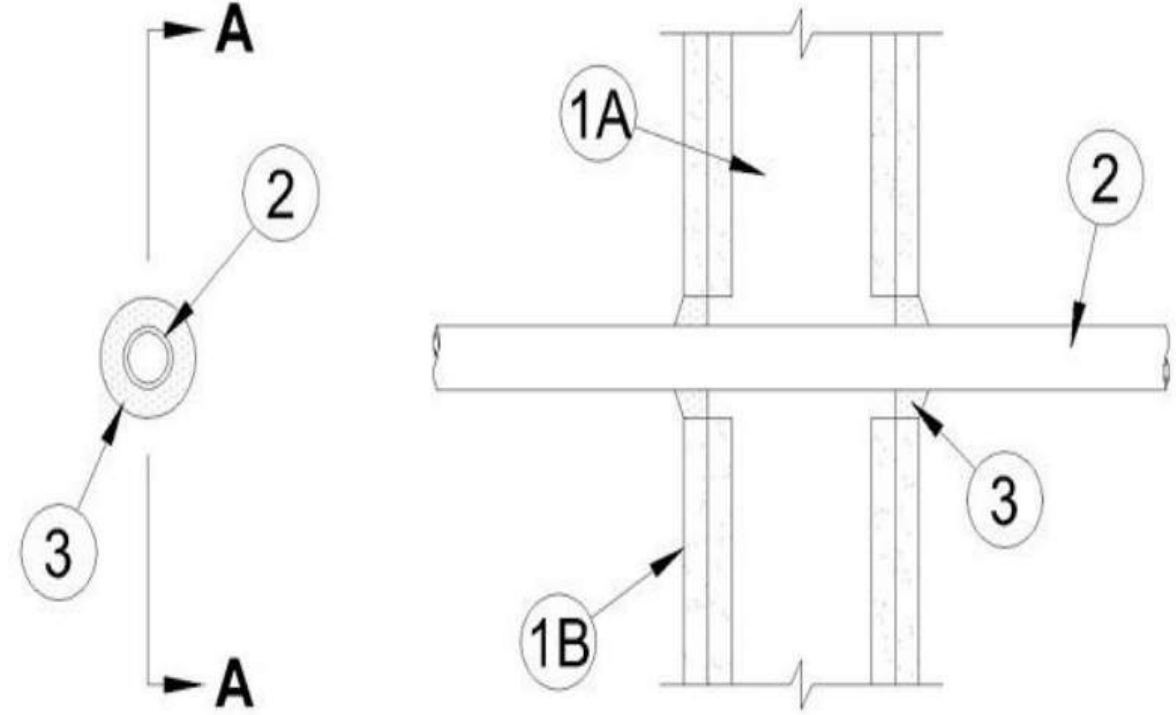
PIPE PEN. @ FLOOR/CEILING
